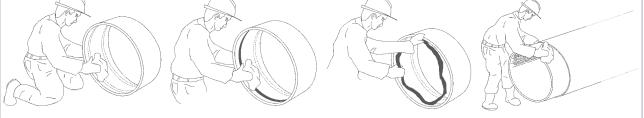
Mounting the Rubber Ring inside Coupler, Step by Step
